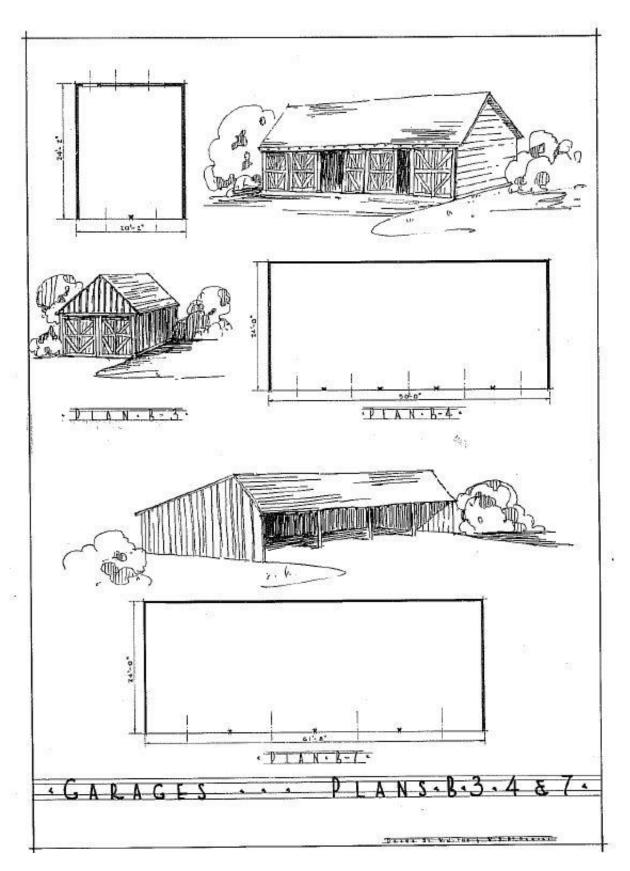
USFS suggested building plans for garages/utility buildings (Fickes, 1935: 543).
